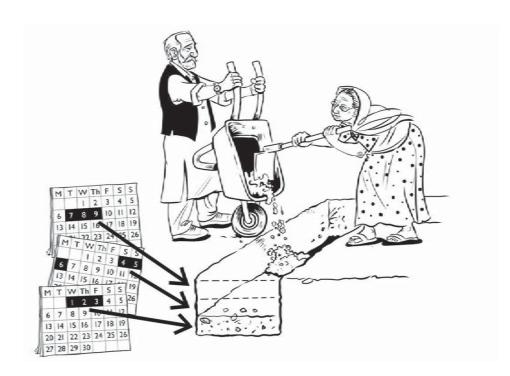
Laying the Foundations, with a workable, but as dry a mix as possible
